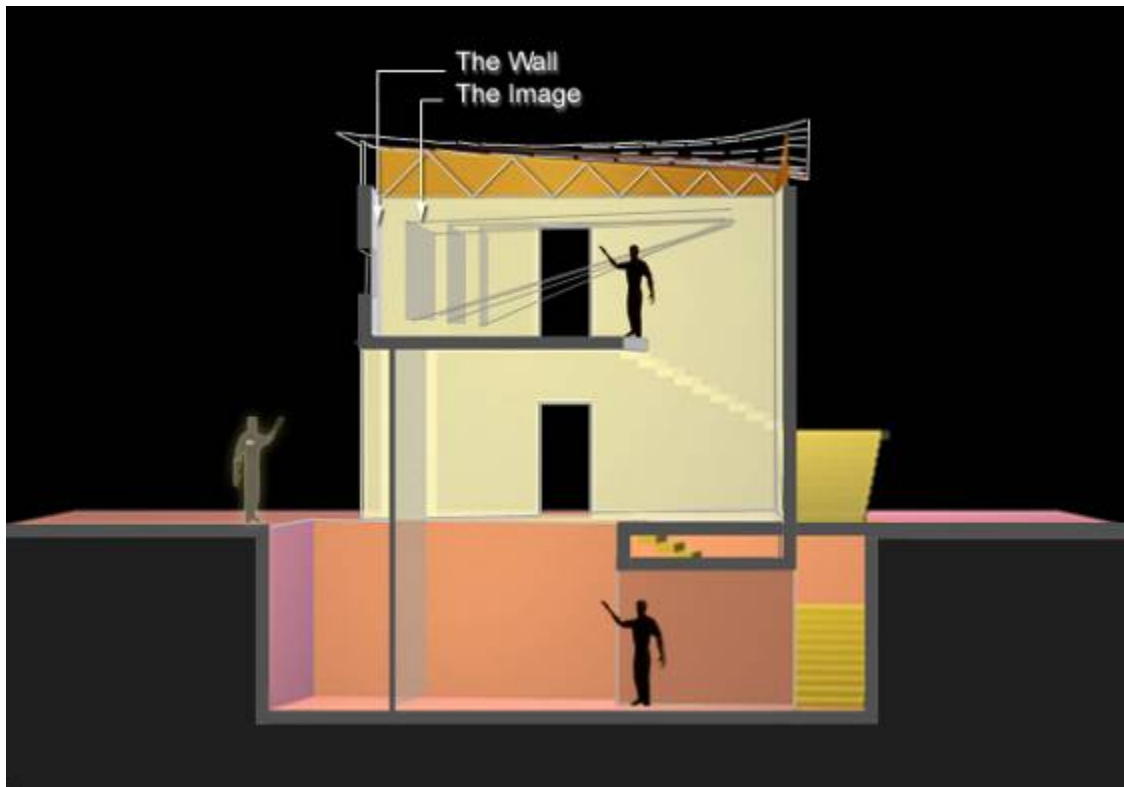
The sketch depicting the cross section is developed into a 3D cross section.
